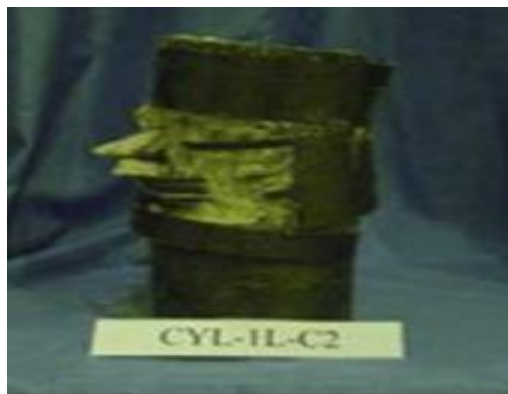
Failure mode of GFRP confined Cylinders specimen
